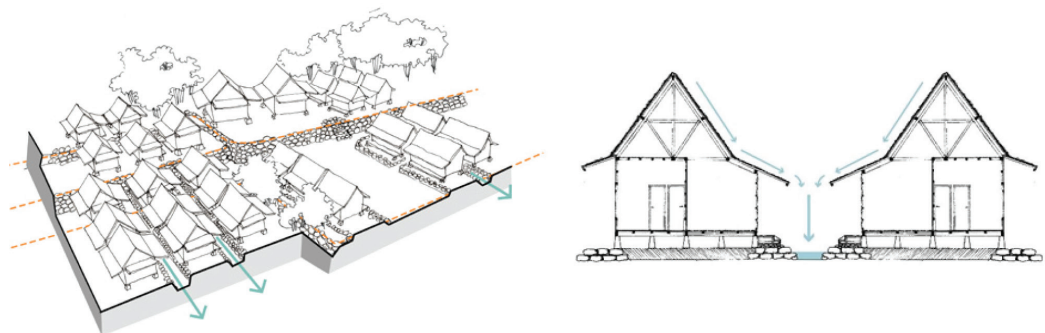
Left: Linear pattern of the houses forming storm water drainage system. Right: Stone podium of the two houses create space to collect and to drain the stormwater. Original image by NanneKnijff (redrawn).
